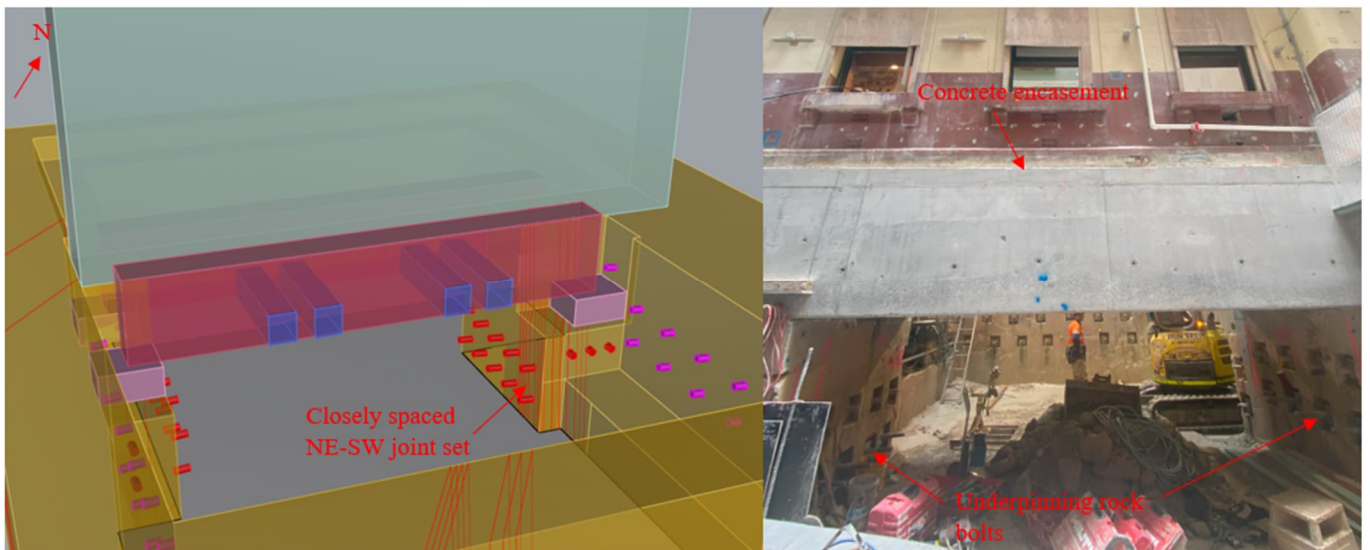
Underpinning the rock pillars - 3D model isometric view (left) and site photography (right)
